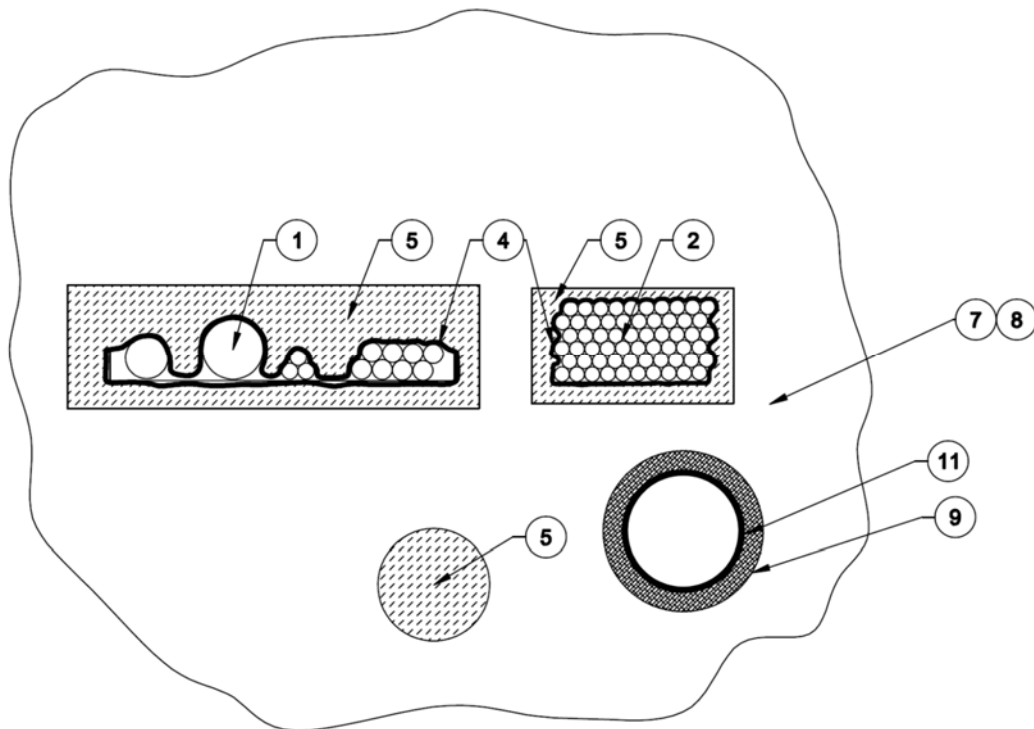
Typical arrangement of 3M Moldable Putty for walls
